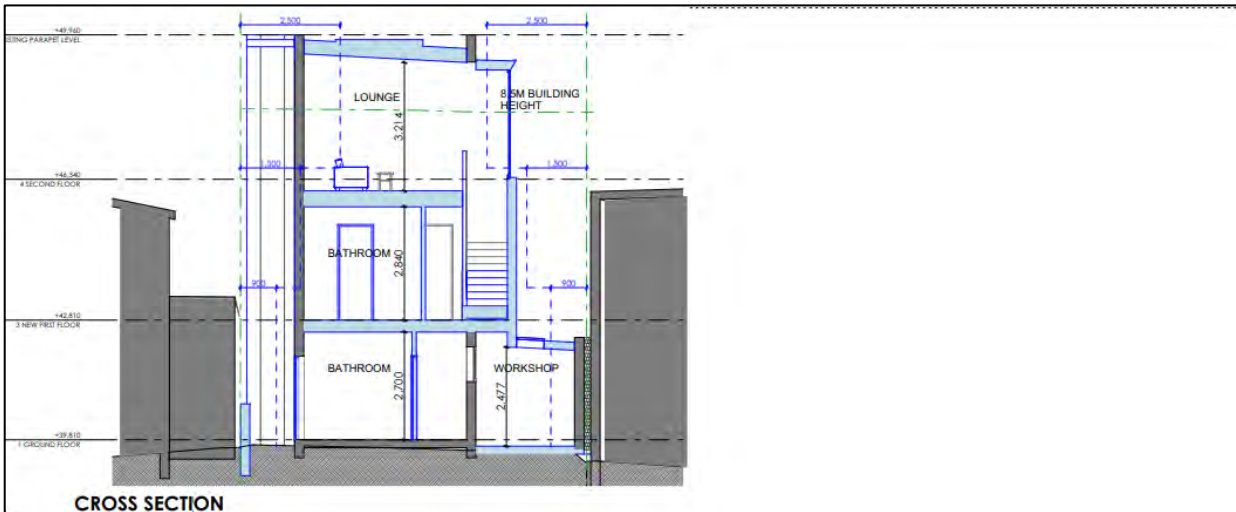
Short Section (Source: Barbara Architecture & Interiors)
